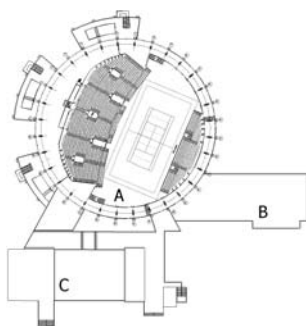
A plan of the ground floor of the Urania. Drawing: B. DEJA
